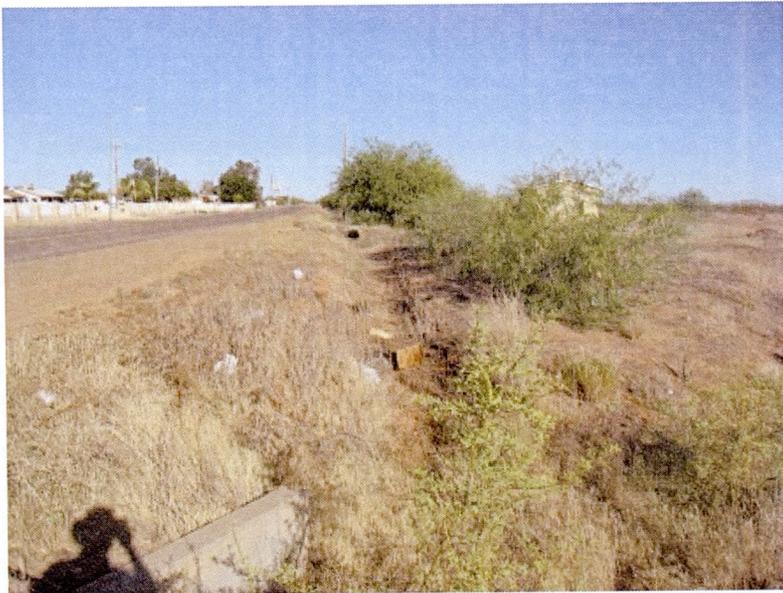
Looking west at drainage ditch 10' bk-bk & 2' bottom north side of old Happy Valley Road from Citrus Road intersection.
